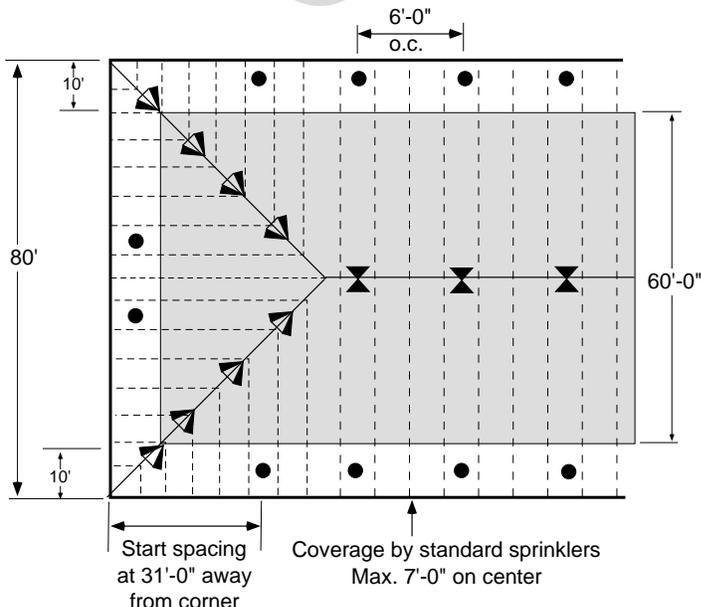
BB™ and HIP™ Sprinklers Plan View Perimeter Protection
